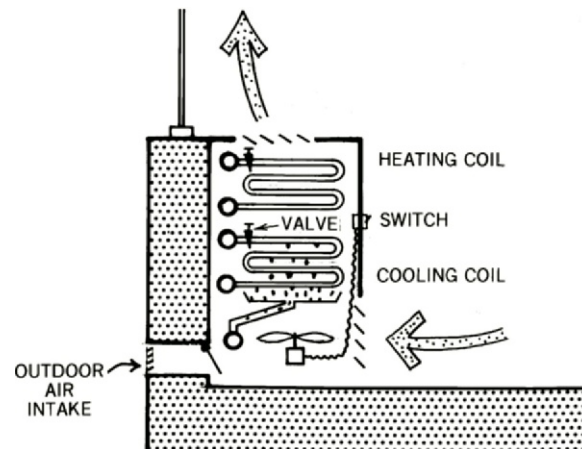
This is a schematic diagram of an under-window fan-coil unit (four-pipe system) with outdoor air intake and a condensation drain.
